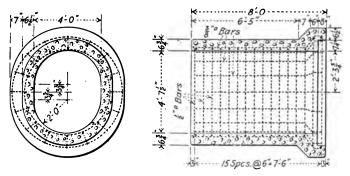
Reinforced Concrete Culvert Pipe, C. R. I. & P. Ry. and C. B. & Q. R. R. (Am. Ry. B. & B. Assn.)
